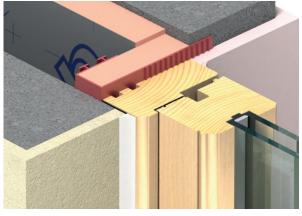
Kingspan Kooltherm® Cavity Closer at a Check Reveal
